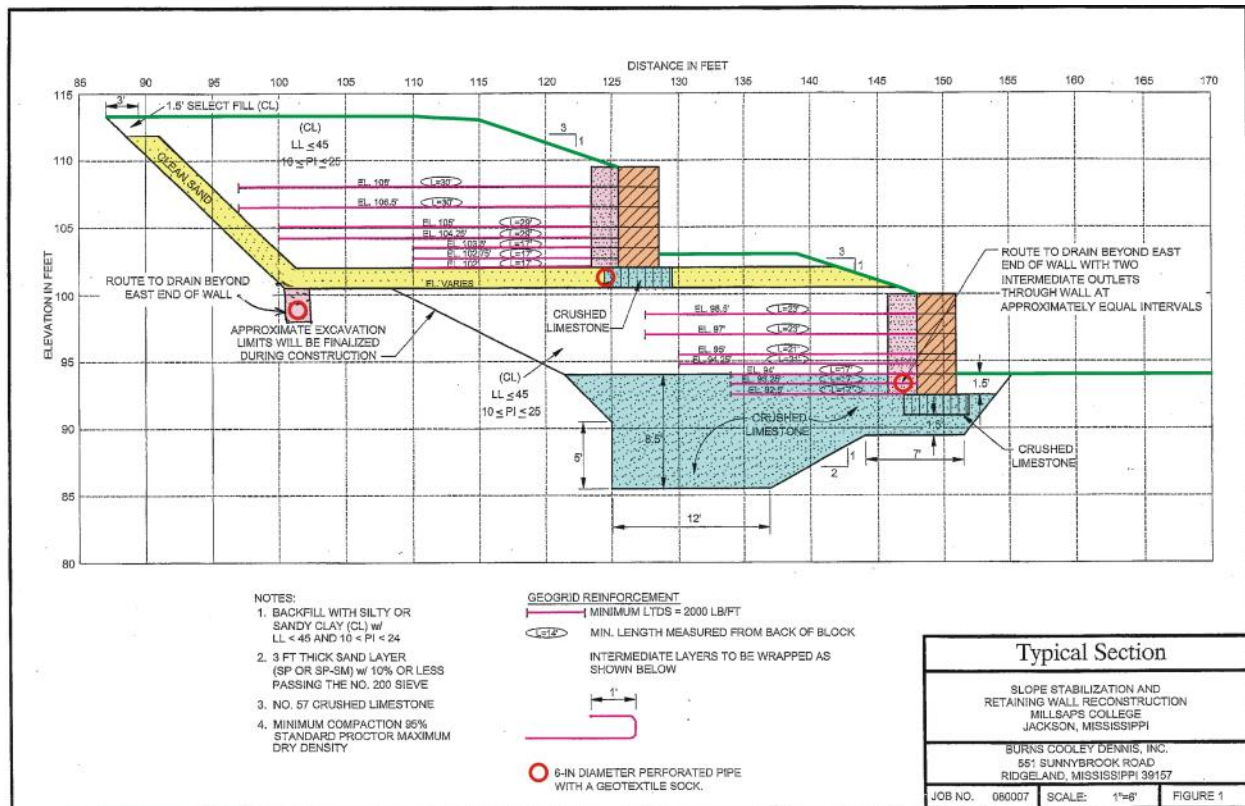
Engineering plans by Burns Cooley Dennis for slope stabilization and retaining wall reconstruction at Millsaps College. The repaired ground surface is in green, the sand chimney is in yellow, drains are in red, the crushed limestone keyway and retaining wall foundations are in blue, the retaining walls are in orange, the gravel fill behind the retaining walls are in light pink, and the layers of geogrid fabric are in hot pink. Image 1925.
